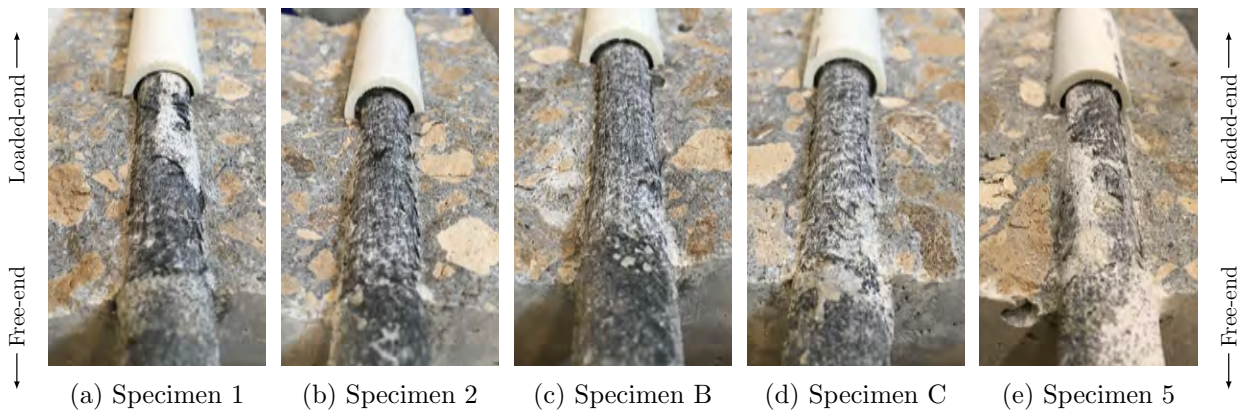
Overview rebar surface after bond strength test on type B Lot 1 rebar # 5
